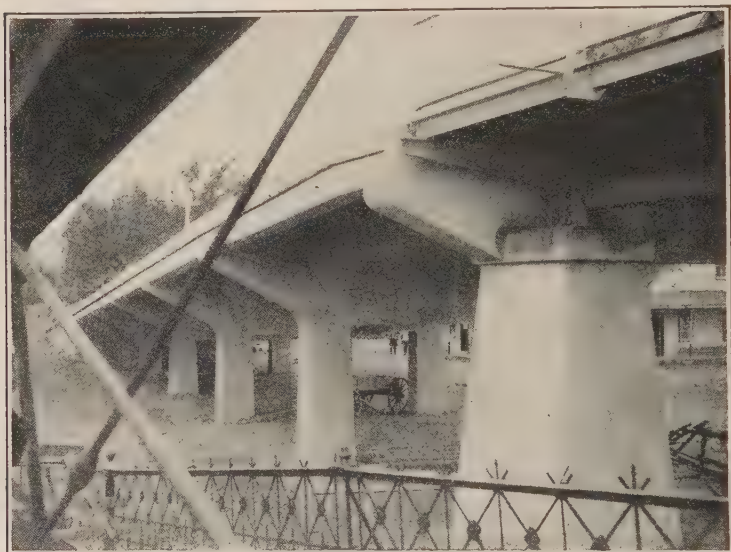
APPROACH TO HIGHWAY BRIDGE AT SYLVAN BEACH. REINFORCED CONCRETE AND SLAB CONSTRUCTION.
